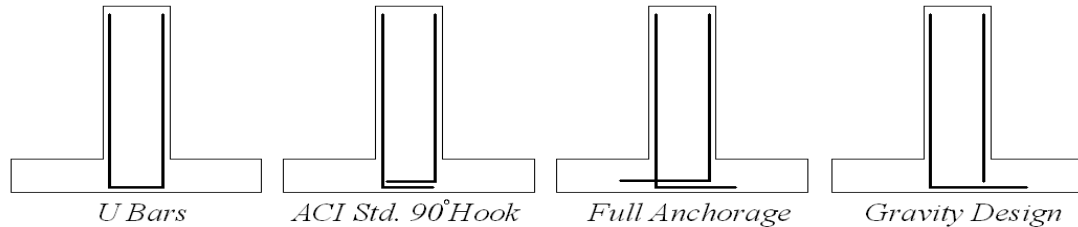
Longitudinal beam anchorage details (Reproduced from Murty *et al.* 2003)
